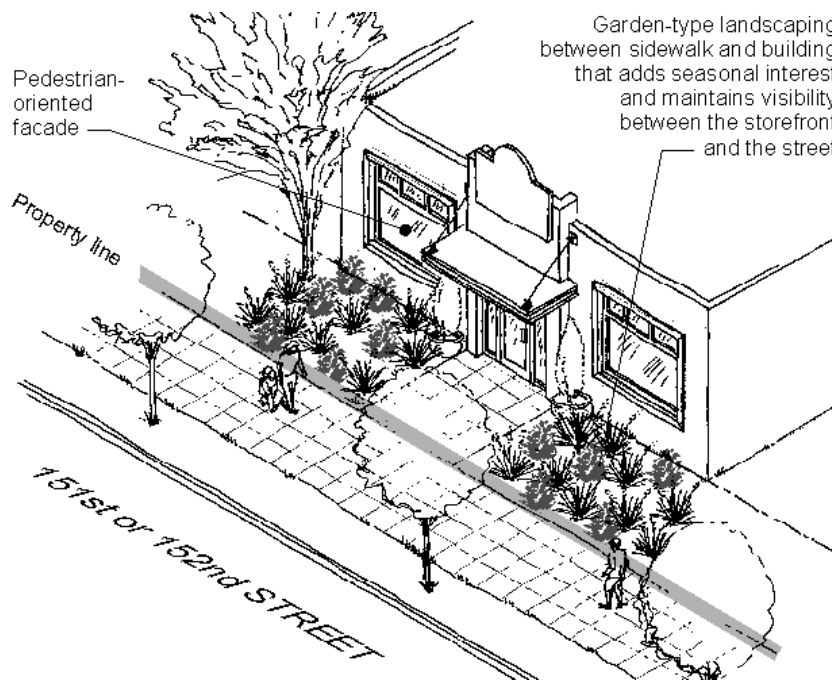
Building setbacks on 151st and 152nd Streets, east of 10th Avenue SW, may be allowed if the space between the sidewalk and the building is maintained as a landscaped area (except for required pedestrian access).
